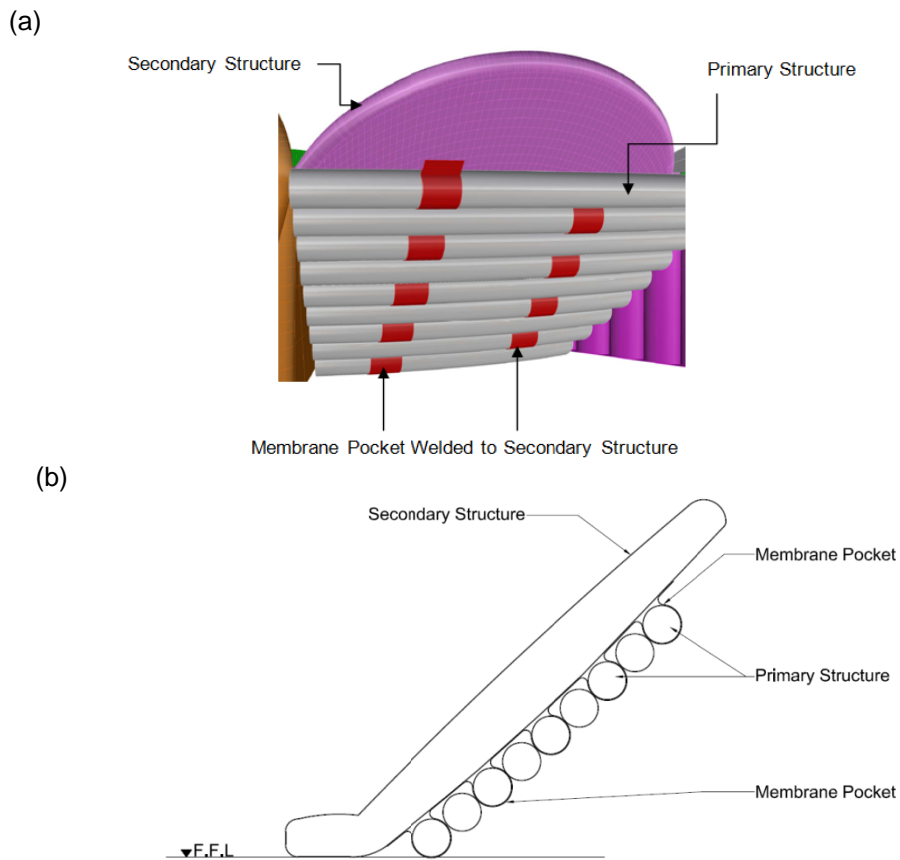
13: Primary and secondary structures connection detail. (a) 3D View; (b) Section.
